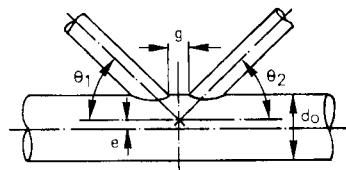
Welded connection with hollow sections directly welded to one another
